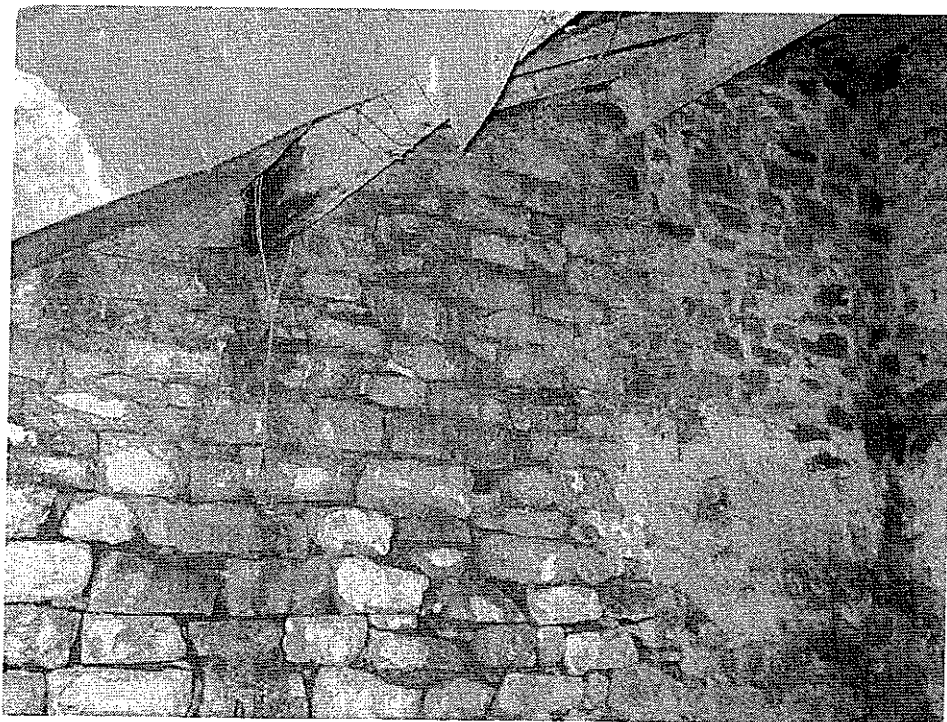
Damp penetration to purlin bearing and North gable (Shippon)
